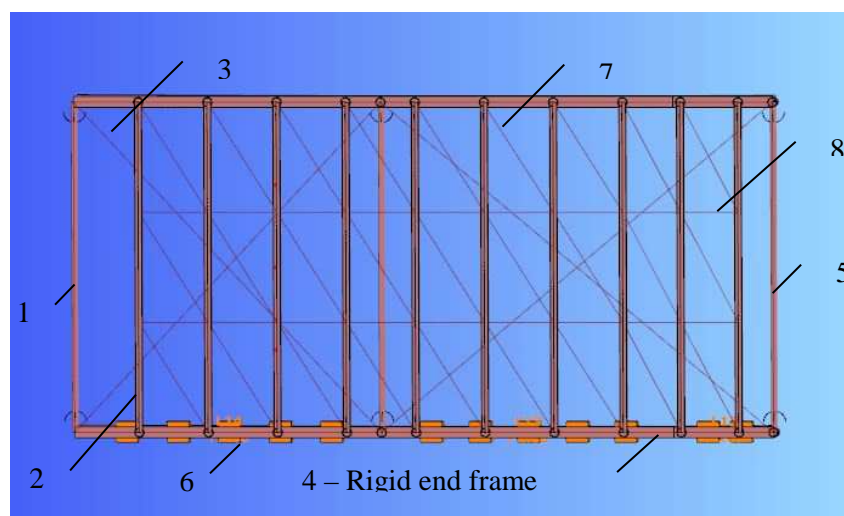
Characteristic roof panel with introduced links in ConSteel software (6.00x12.40m)
